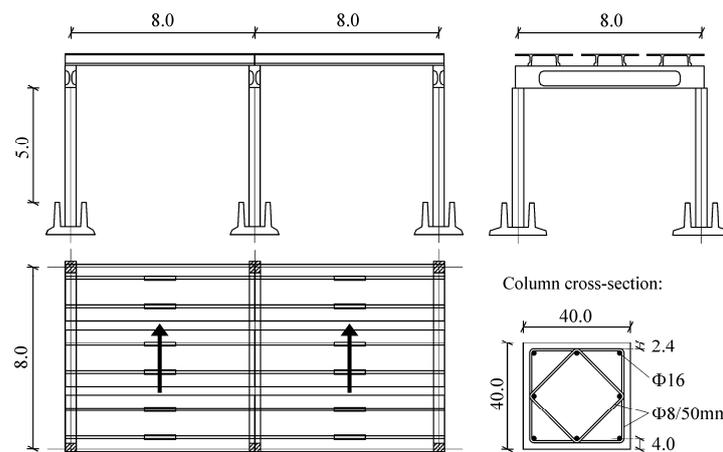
Precast industrial building tested at ELSA, Ispra, Italy
